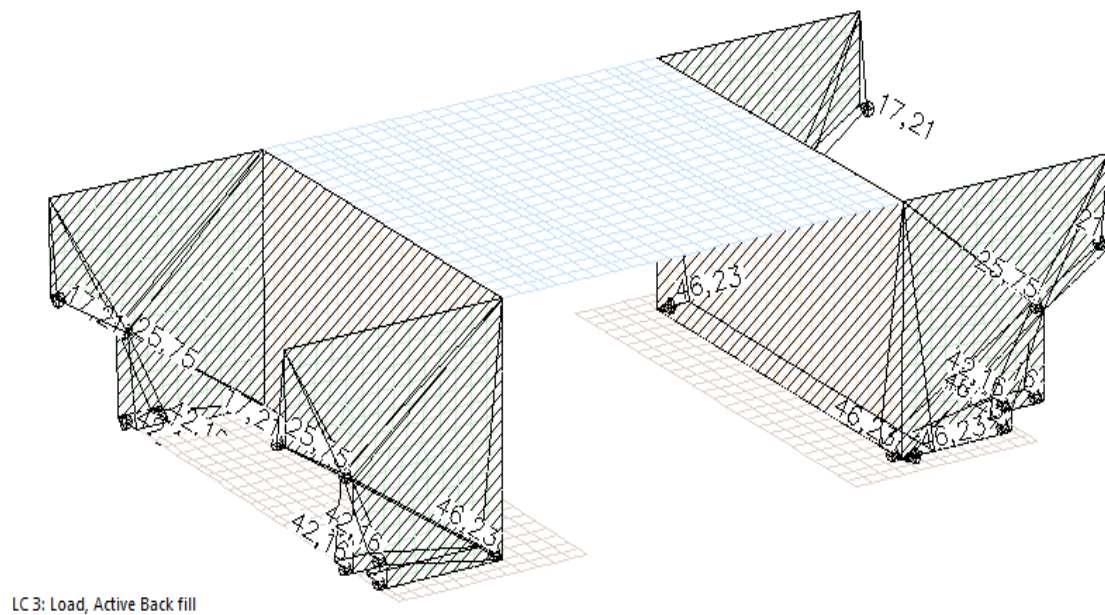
48 earth pressure on the Abutment and Wing Wall
